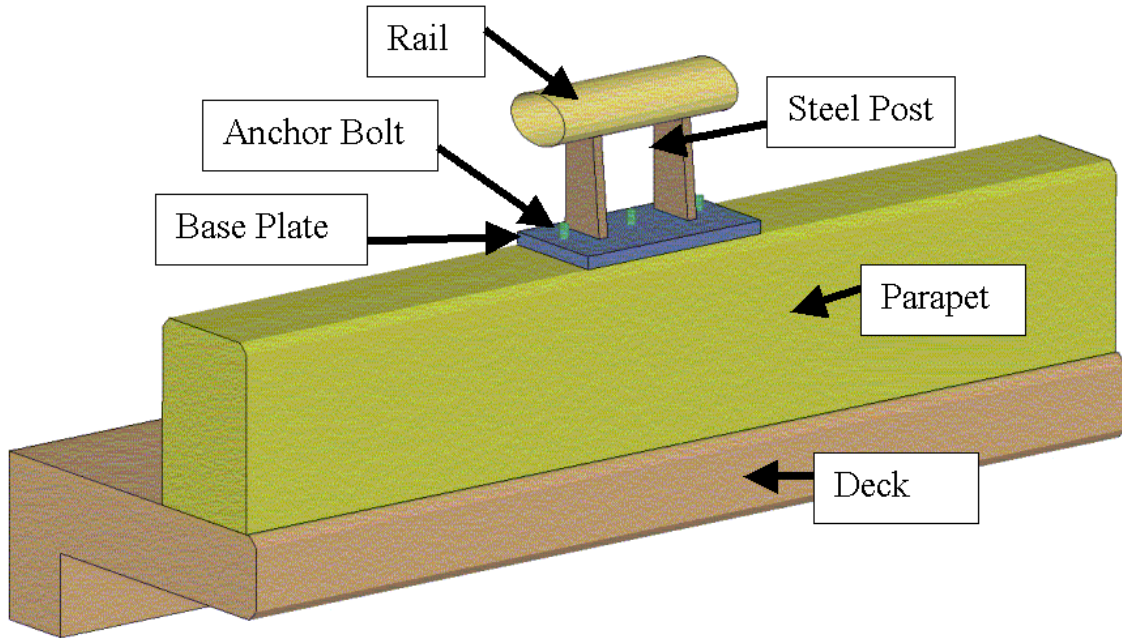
Model of T4 bridge rail specimen with three-bolt anchorage and 317.5-mm- (12.5-inch-) wide parapet.
